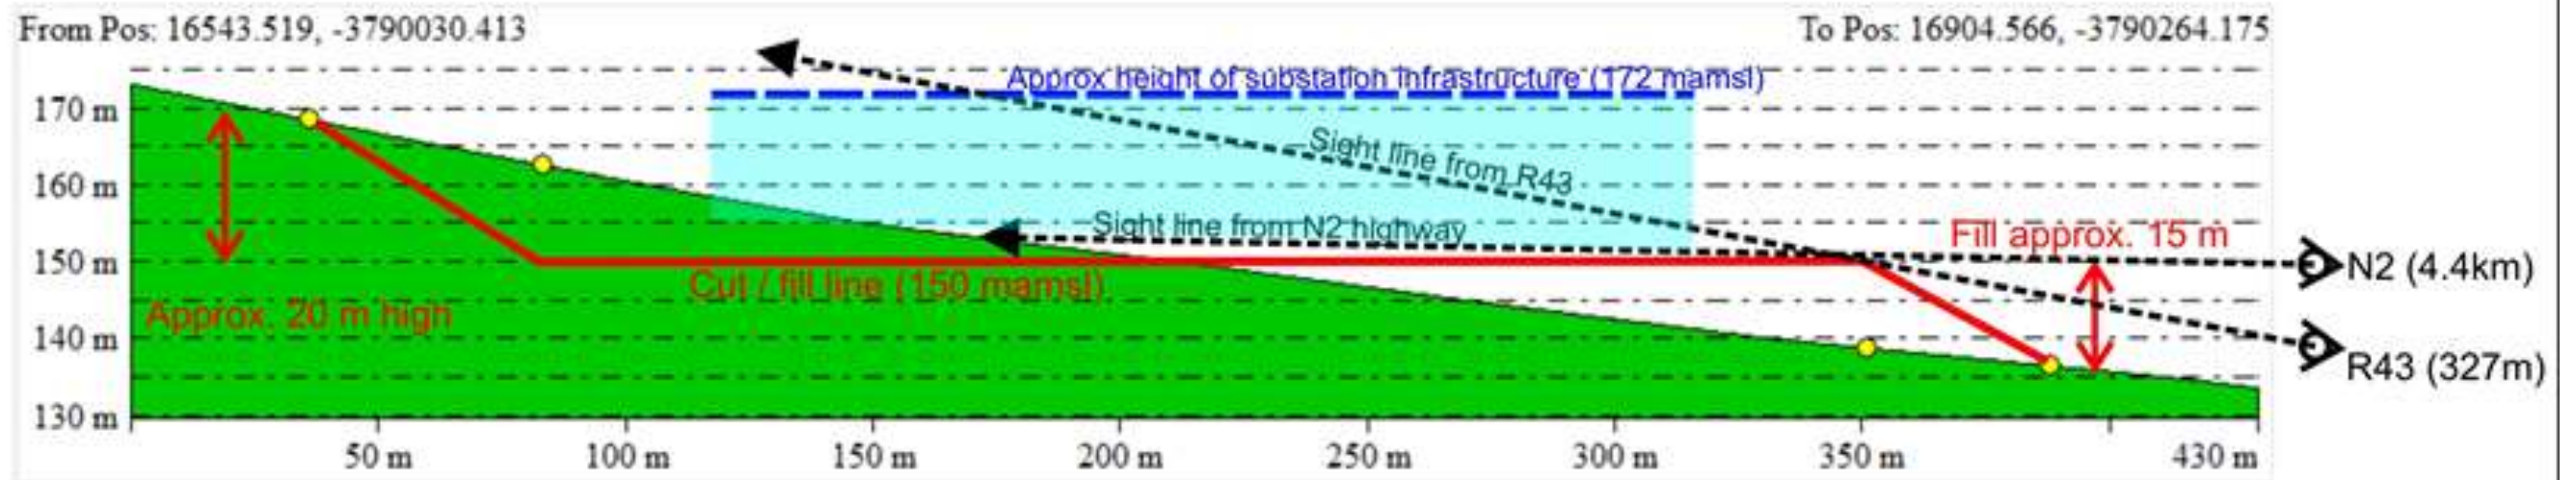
Concept of Mitigation Proposed for Site Alternative 1: Layout Alternative 1
